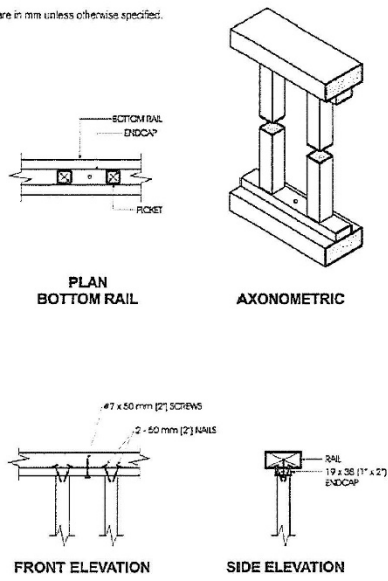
Drawing showing EC-1 connection type, one of the proposed connections for the railings/guards for the proposed porch at 59 Albion Street
